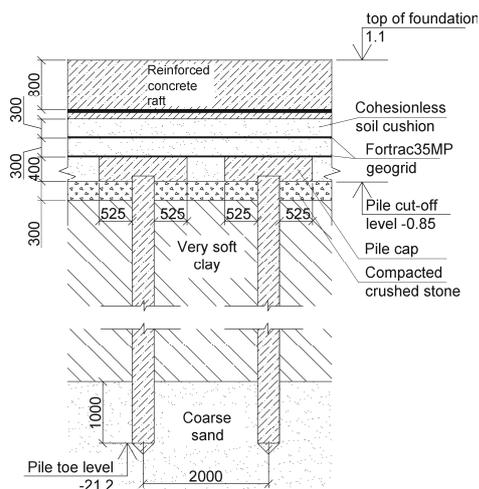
Foundation of the Organizing committee Building in Sochi (Russia). Detail of the pile foundation disconnected from the raft (Petrukin *et al.* 2013).
